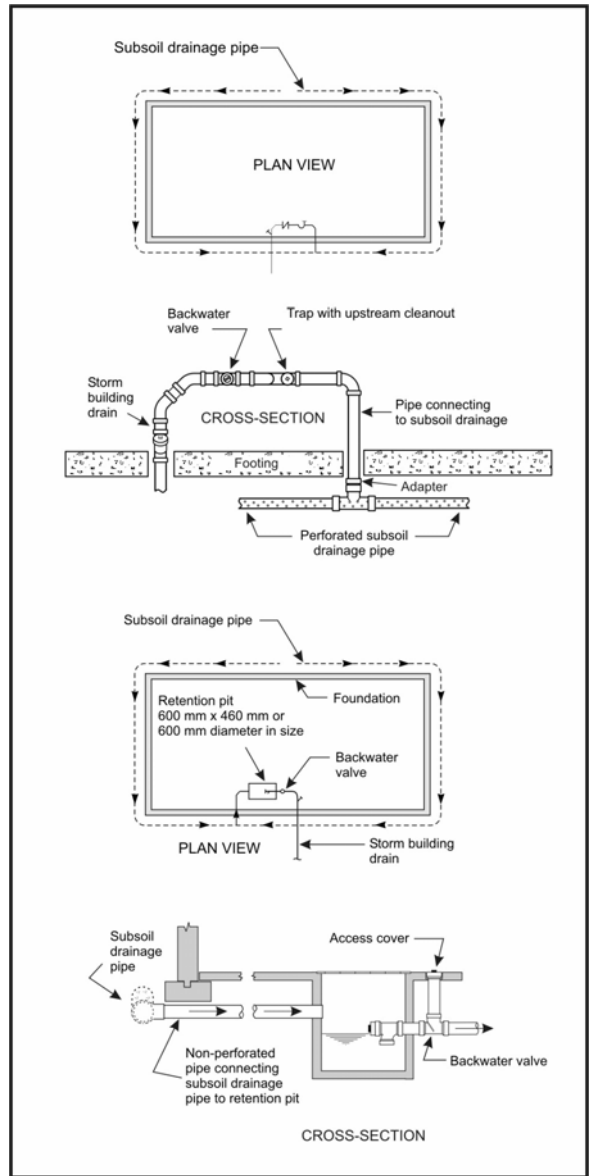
(1) Subsoil Drainage Connection.”;
